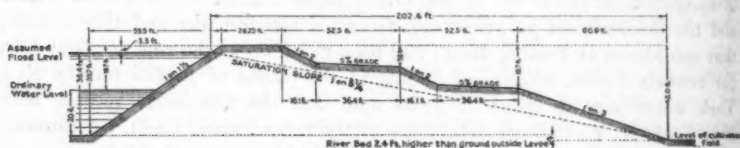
TYPICAL SECTION OF LEVEE ON RIGHT SIDE OF THE ADIGE RIVER.
